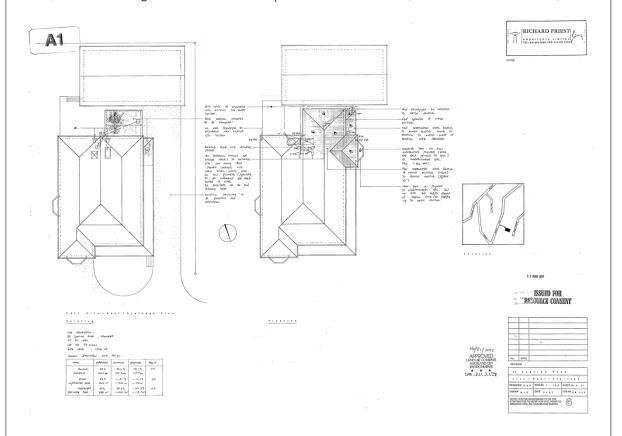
Architectural drawings showing the new rear addition to the dwelling in 1997 (Auckland Council property records: 35 Seaview Road).
